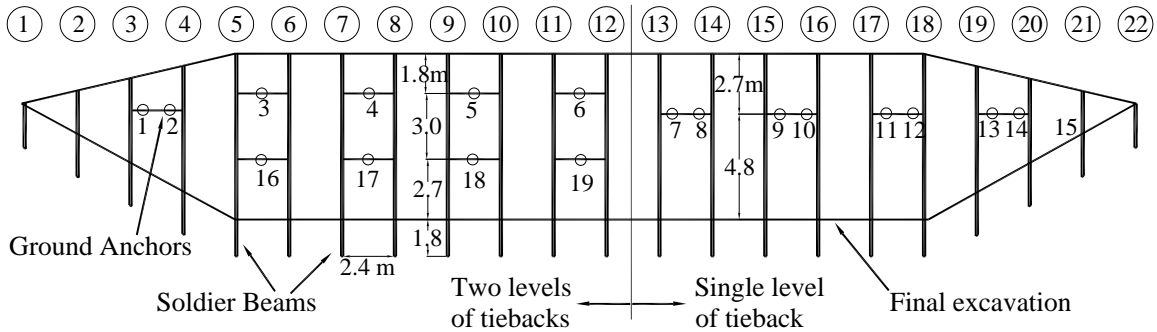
Elevation view of the wall (modified after FHWA-RD-98-066)
